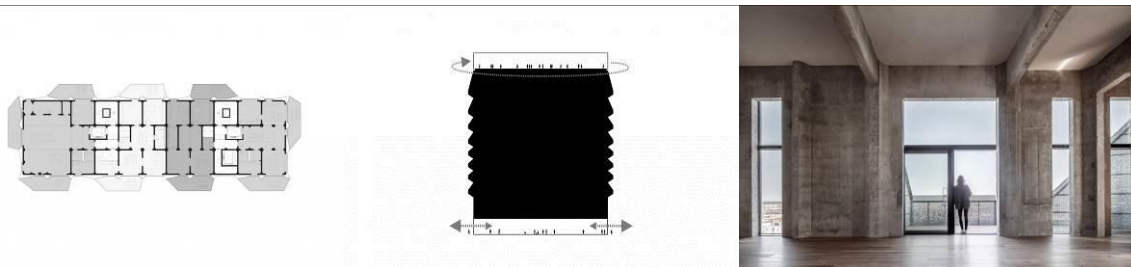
(a) Sample floor layout; (b) Schematic showing private and public spaces; (c) Internal view
